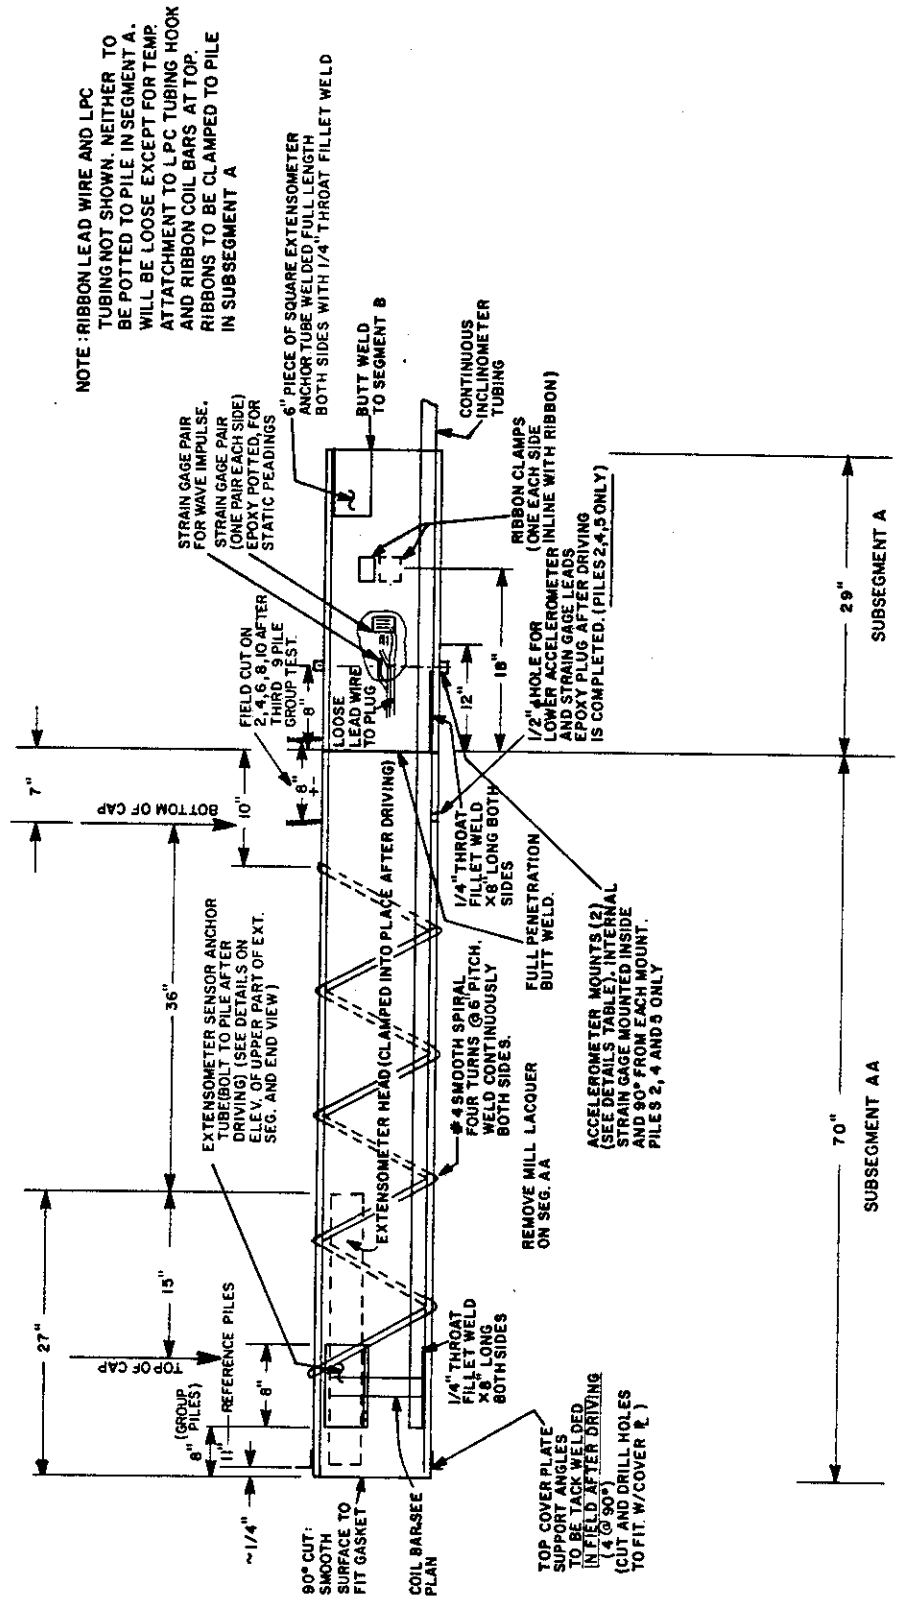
ELEVATION CUTAWAY OF EXTENSION SEGMENT FOR GROUP PILES
